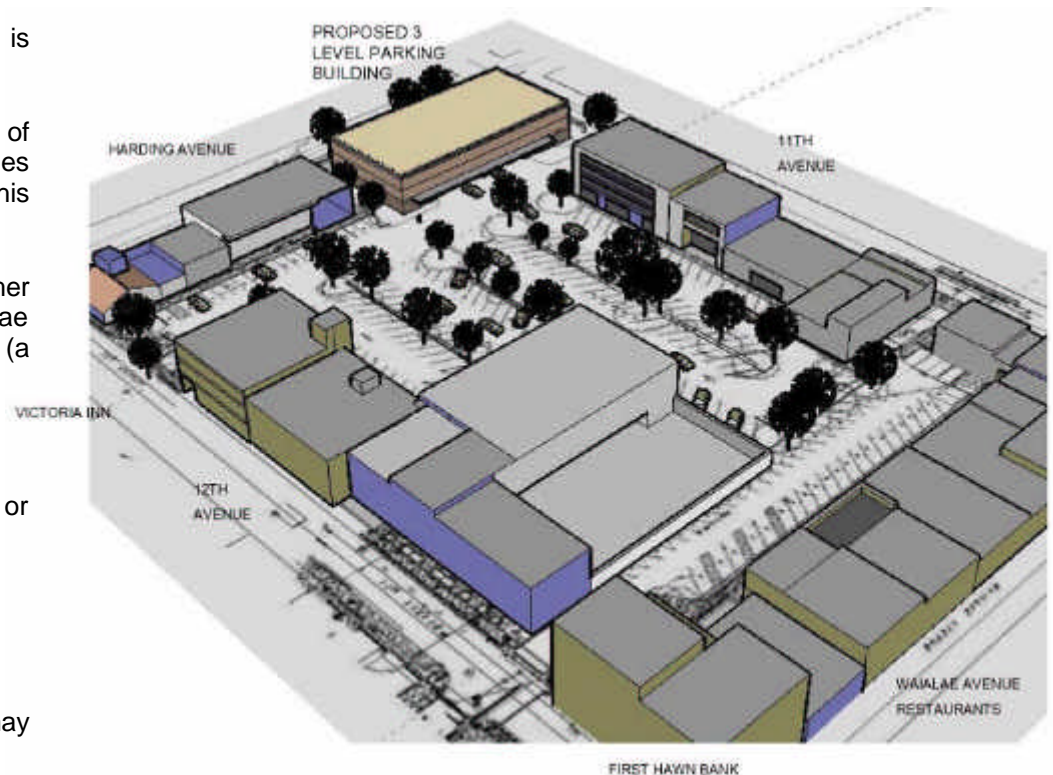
Axonometric View of Option 2, looking in makai direction toward Harding Avenue and 11<sup>th</sup> Avenue
